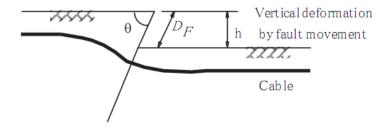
Cable deformation at intersection with compressive faults (reverse)
